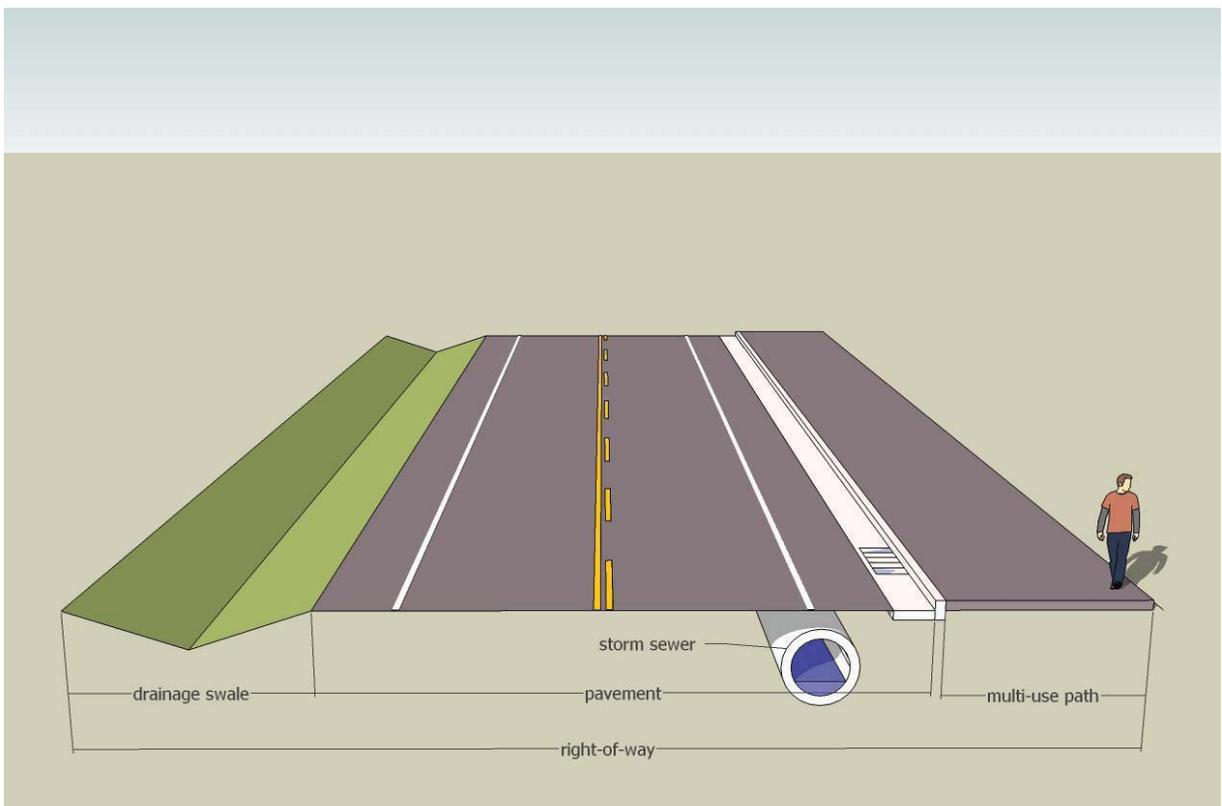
ST-255, Non-Curb and Gutter Section, Hybrid
